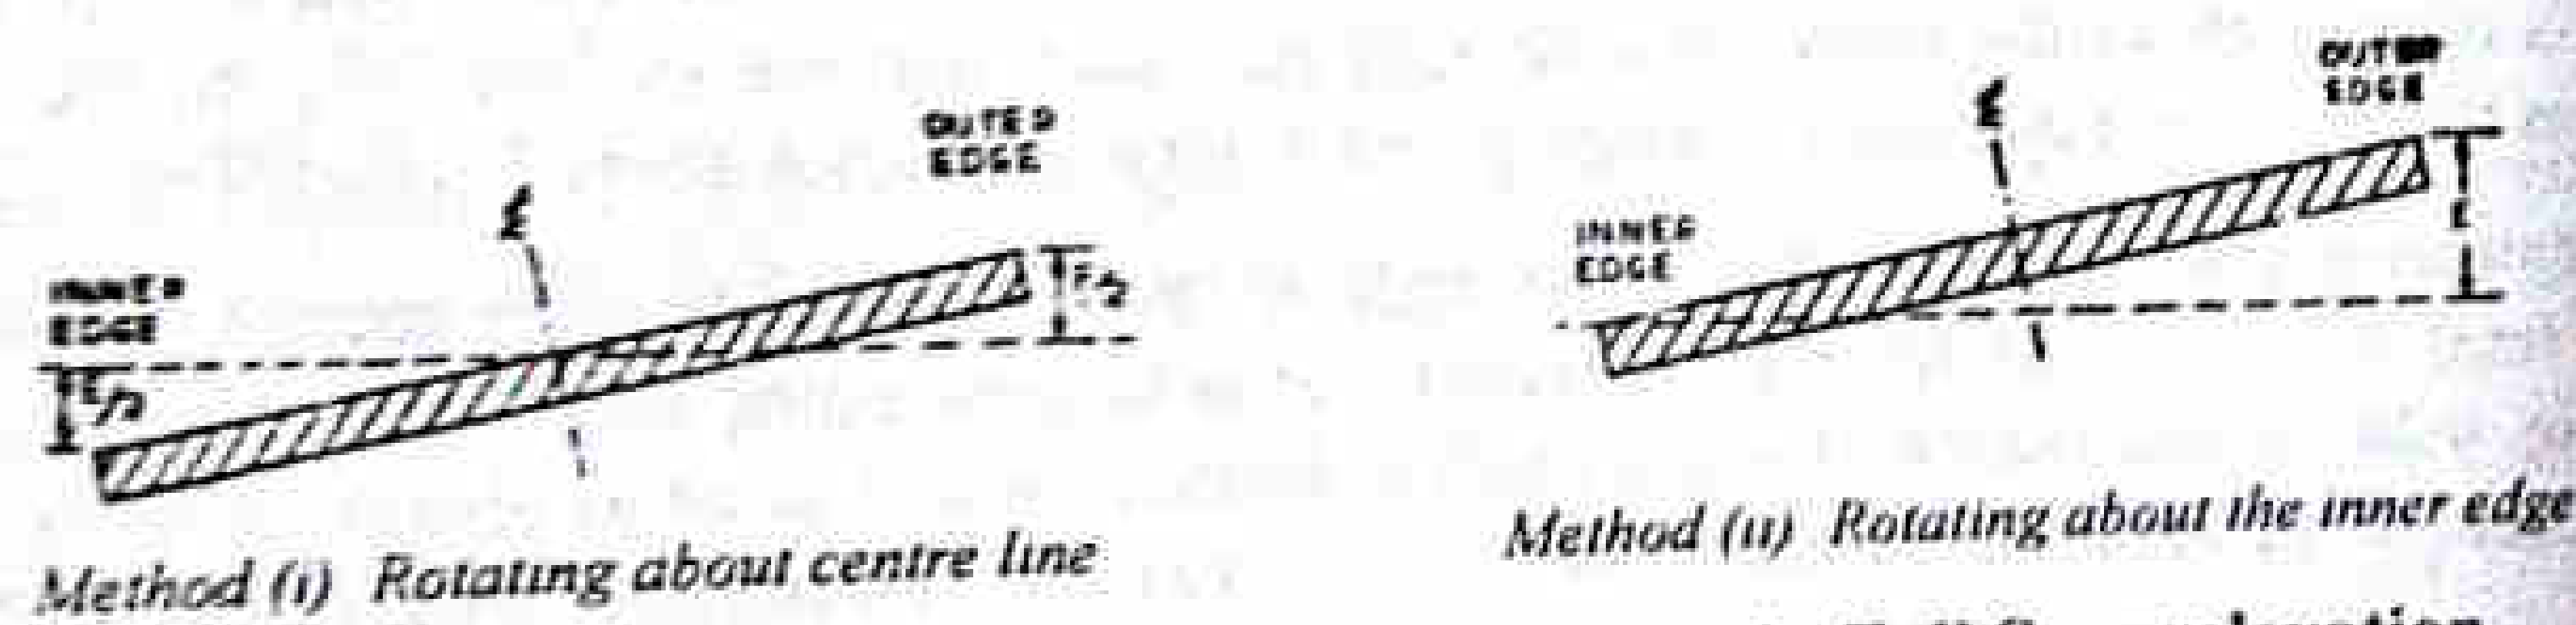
Rotation of Pavement Section to attain Full Superelevation
